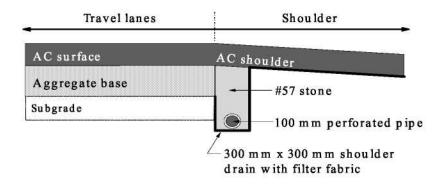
Typical AC pavement with pipe edgedrains (ERES, 1999).
